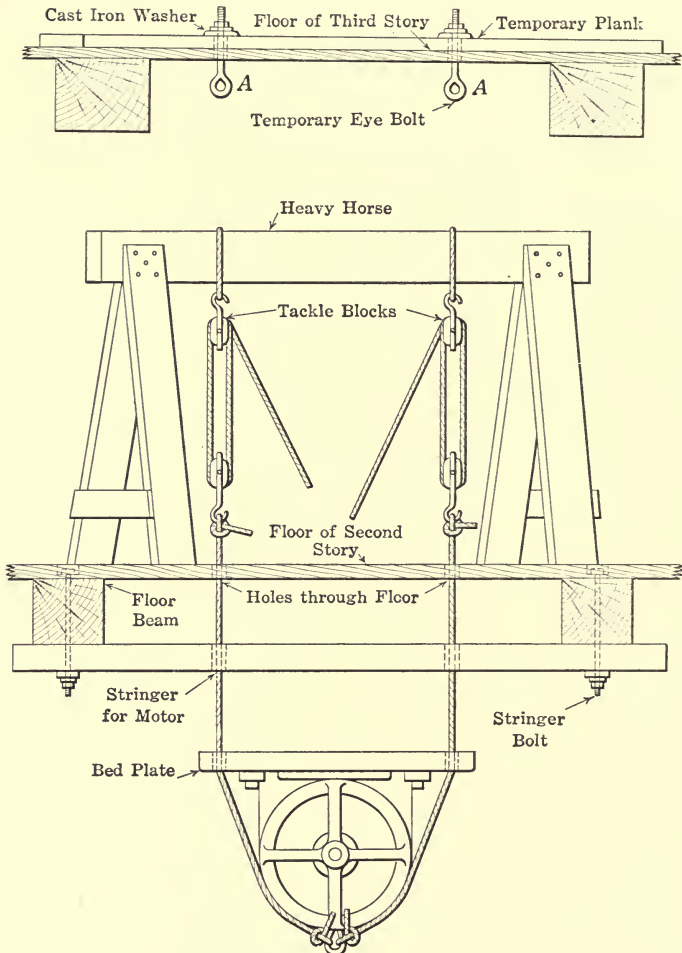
SIDE ELEVATION OF HOISTING OUTFIT.
